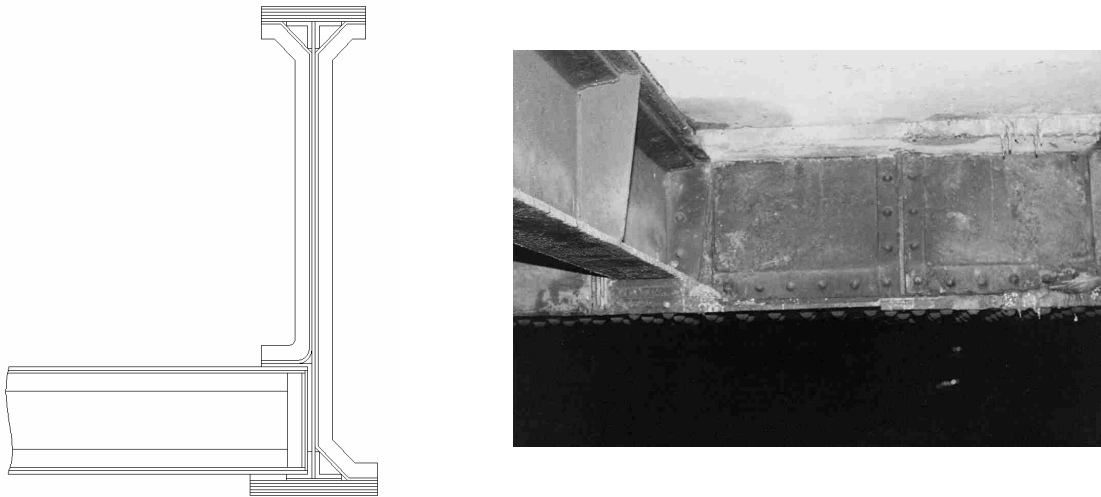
Typical Connection Between Cross Deck and Edge Girder
